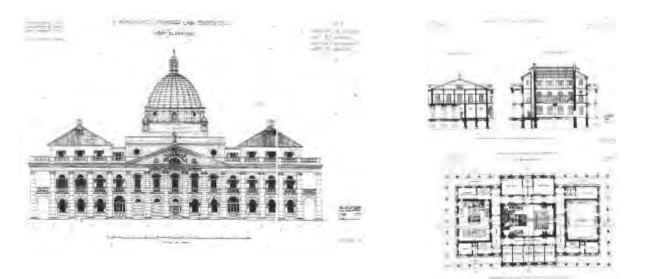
Design Drawings (left) and plans (upper and lower right) of the Proposed Law Court of Hong Kong, the design was commissioned by the Crown consulting architects, Aston Webb & Ingress Bell, 1899 (Source: Architectural Office, Public Works Department. Record Drawings. Architectural Services Department. Architectural Services Department – Hong Kong. Hong Kong: The Government Printer, n.d.
